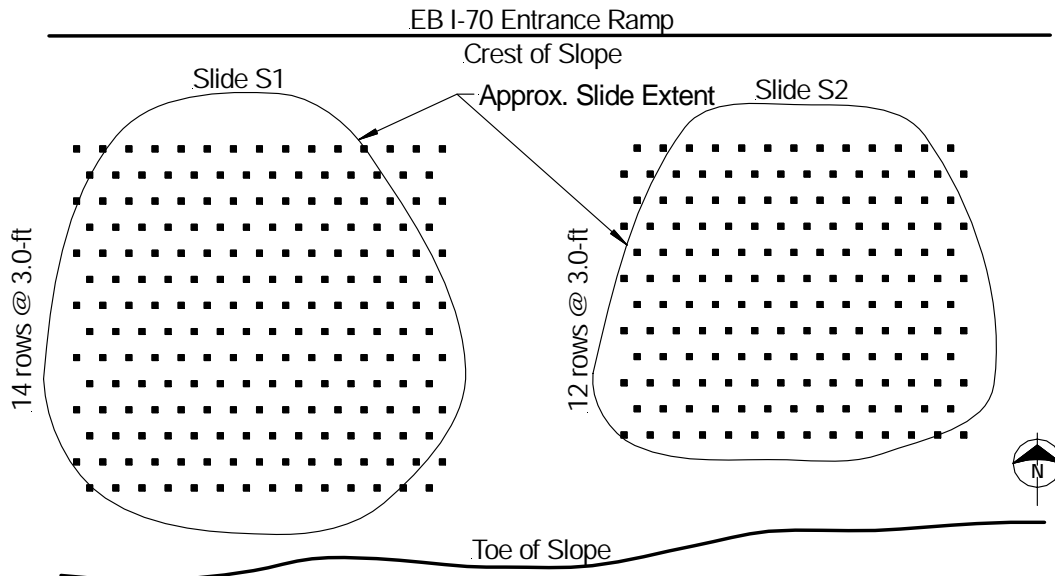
Plan view of slide areas S1 and S2 at the I70-Emma site showing selected layout of reinforcing members.
